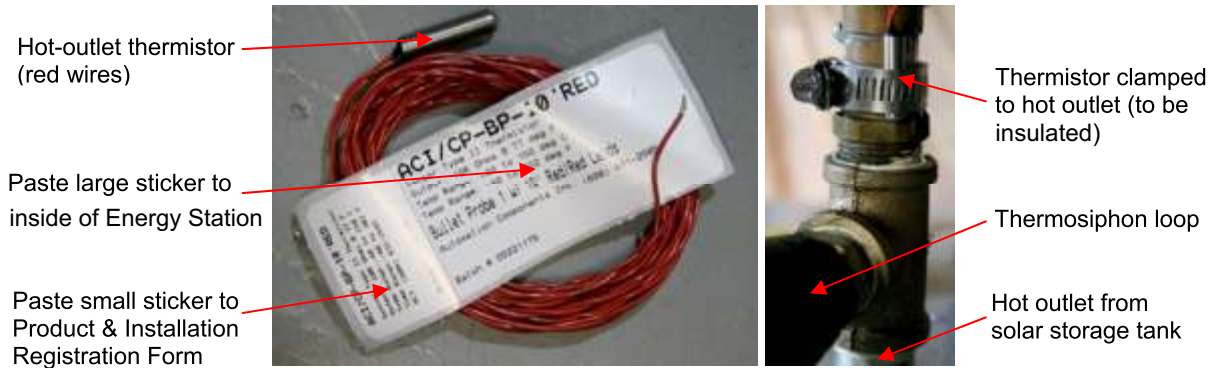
Hot-outlet thermistor (red wires) clamped to hot outlet of solar storage tank).
